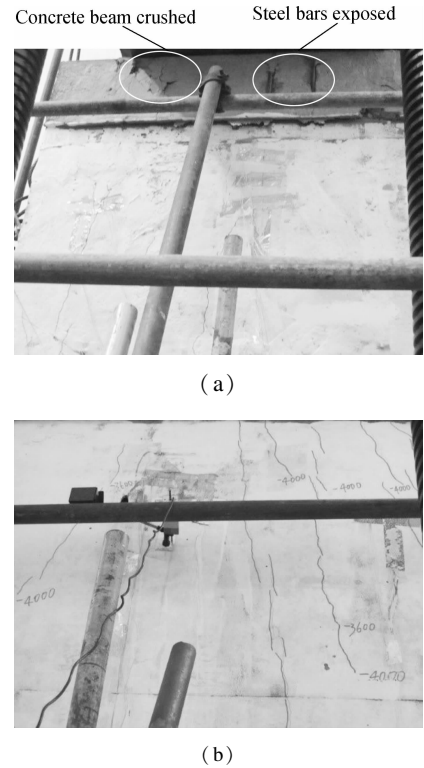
Failure characteristics of specimen DW3. (a) Concrete crushed and steel bars exposed; (b) Crack pattern
